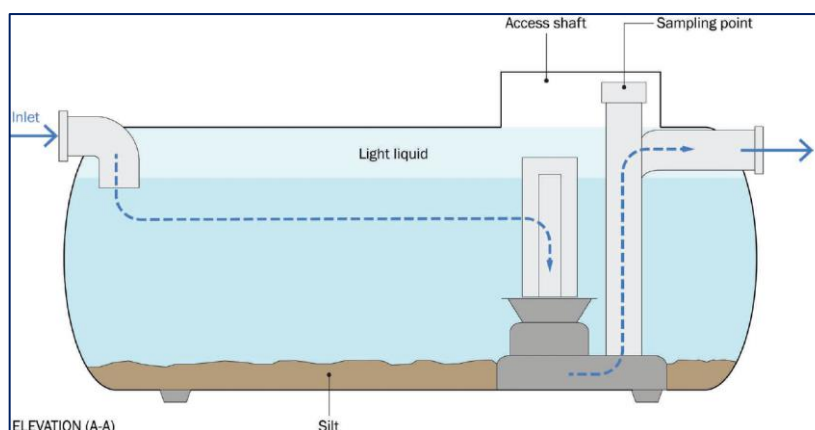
Typical Section Detail of Fuel Separator (CIRIA C753)
